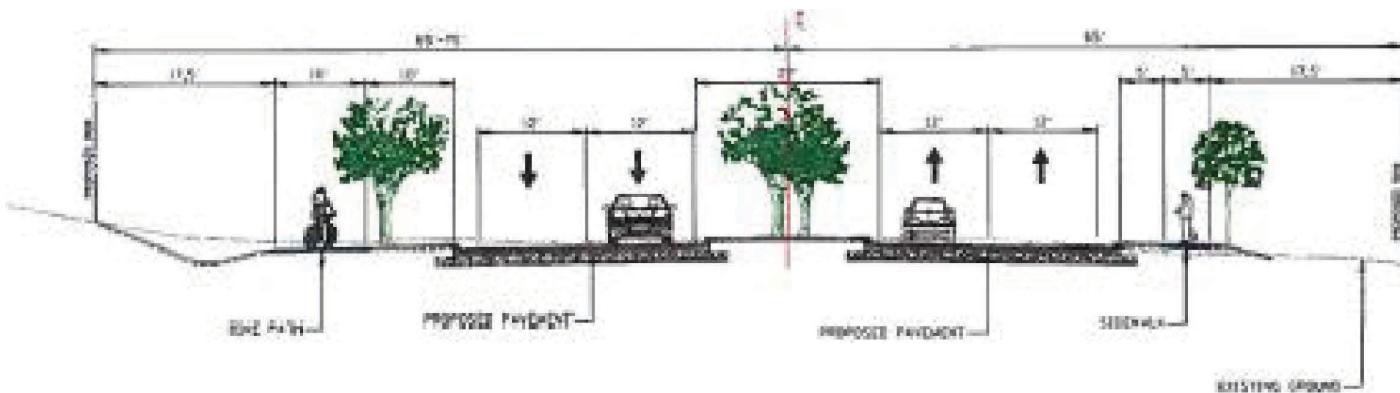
Proposed typical cross section for proposed alignment of highway (bypass).
